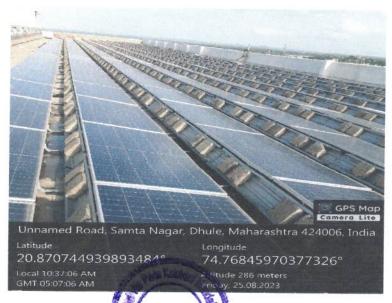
Photo. A view of photo ottaic panels sat-up on Institute's Rooftop
